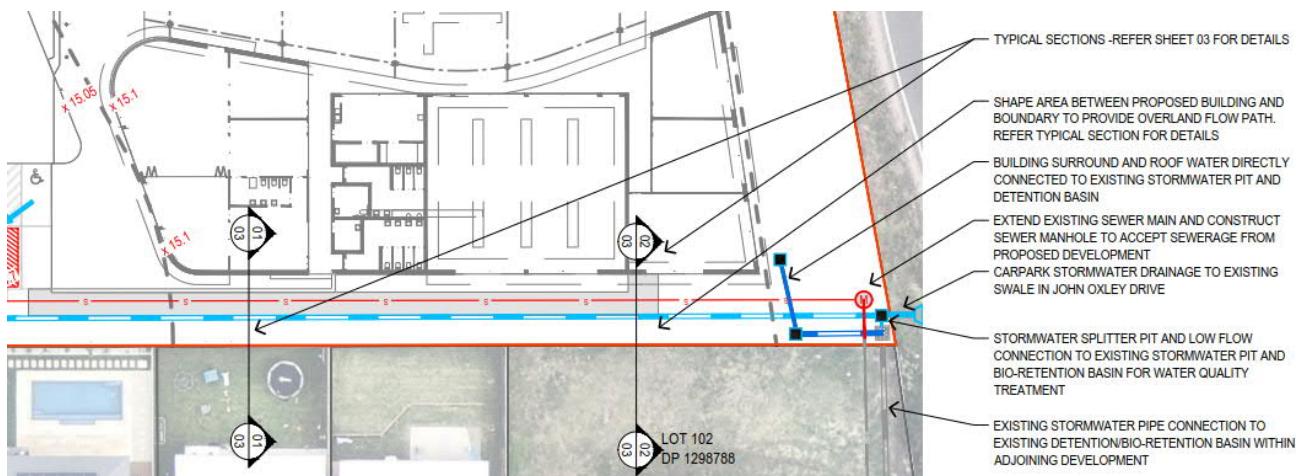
Extract from Stormwater Management, Servicing and Access Plan - Eastern Boundary treatment
